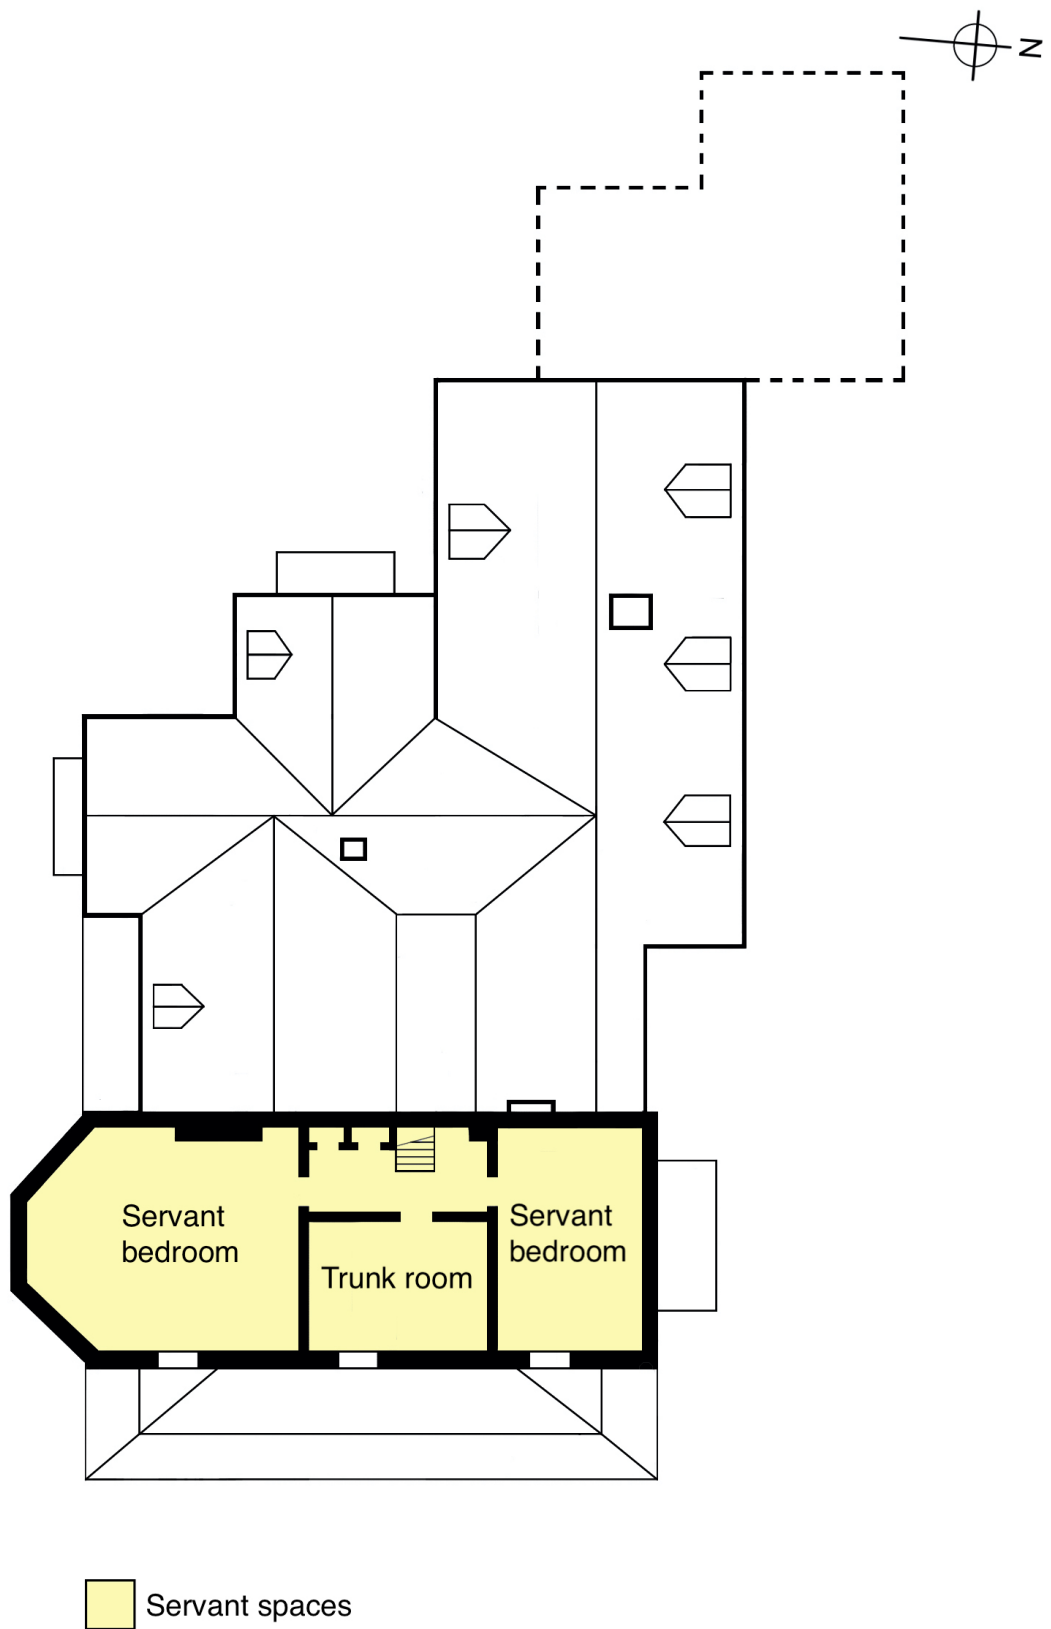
Kingscote 1878 Phase 2 second floor plan
